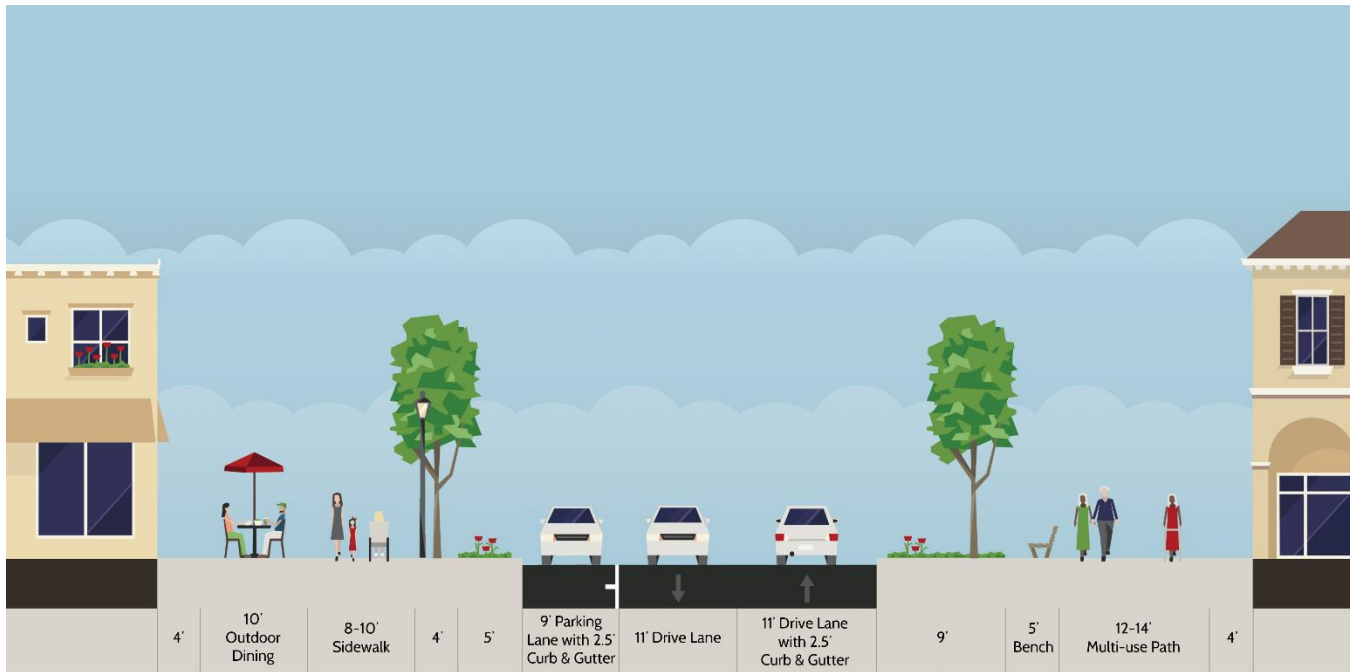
Proposed Typical Section for Local Street in Activity Center with Multiuse Path
